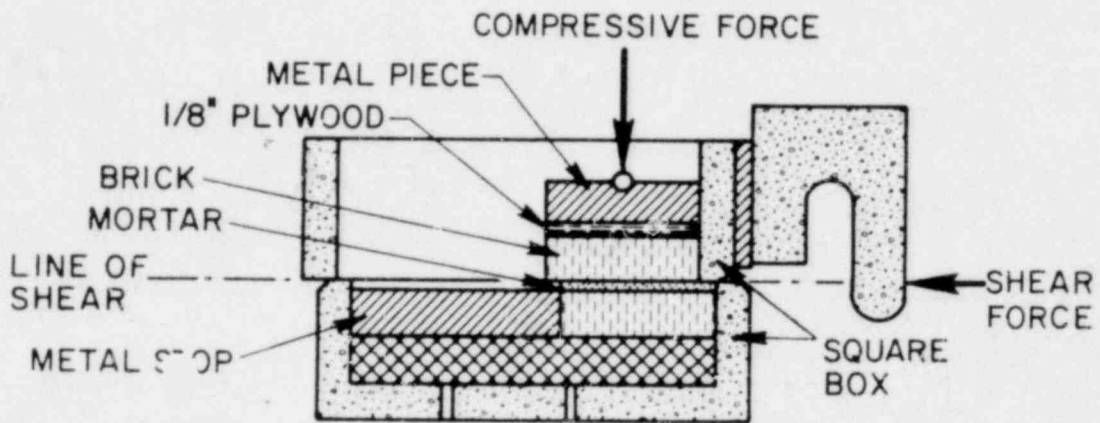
SHEAR BOX TEST ARRANGEMENT
